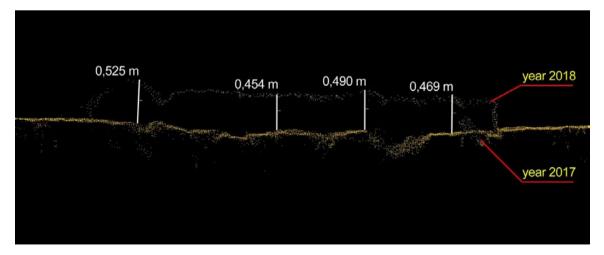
Plan of walls from 2017 (before the wall slided) and 2018 (after the wall slided) – authors' own elaboration
